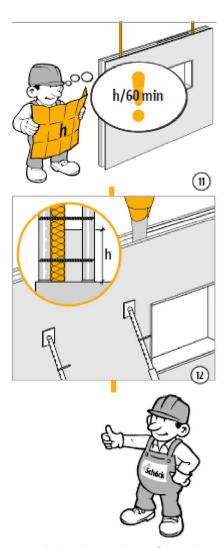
Installation instruction - Schöck Isolink® for element wall – page 3
